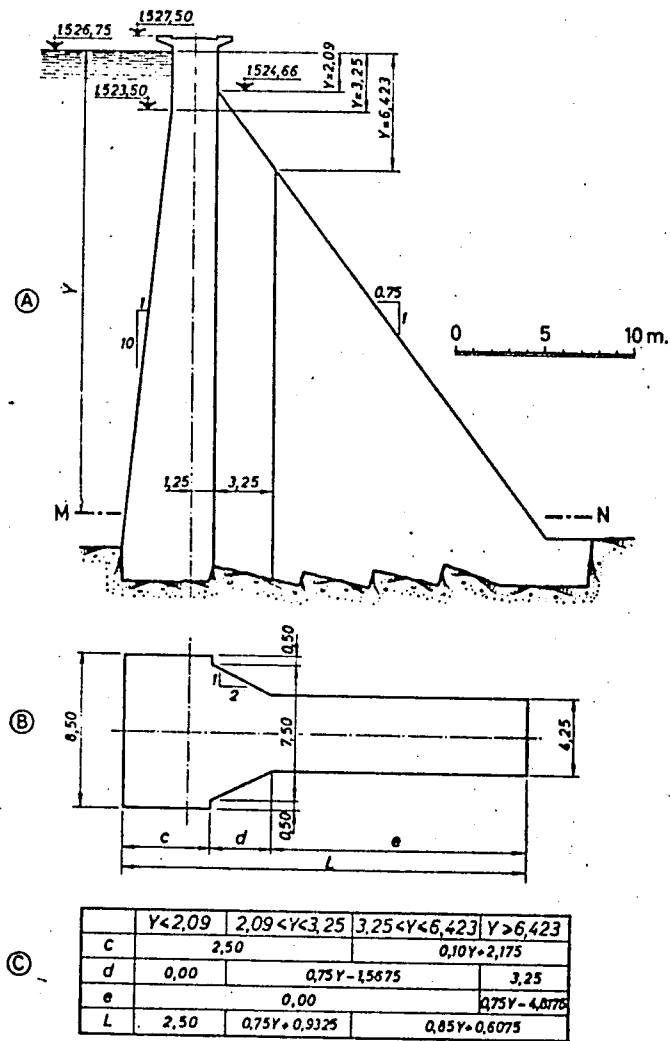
FIG. III (A) LATERAL ELEVATION (B) PLAN AND (C) DIMENSIONS OF THE VEG DE TE RA DAM MODEL TESTED AFTER THE FAILURE.
